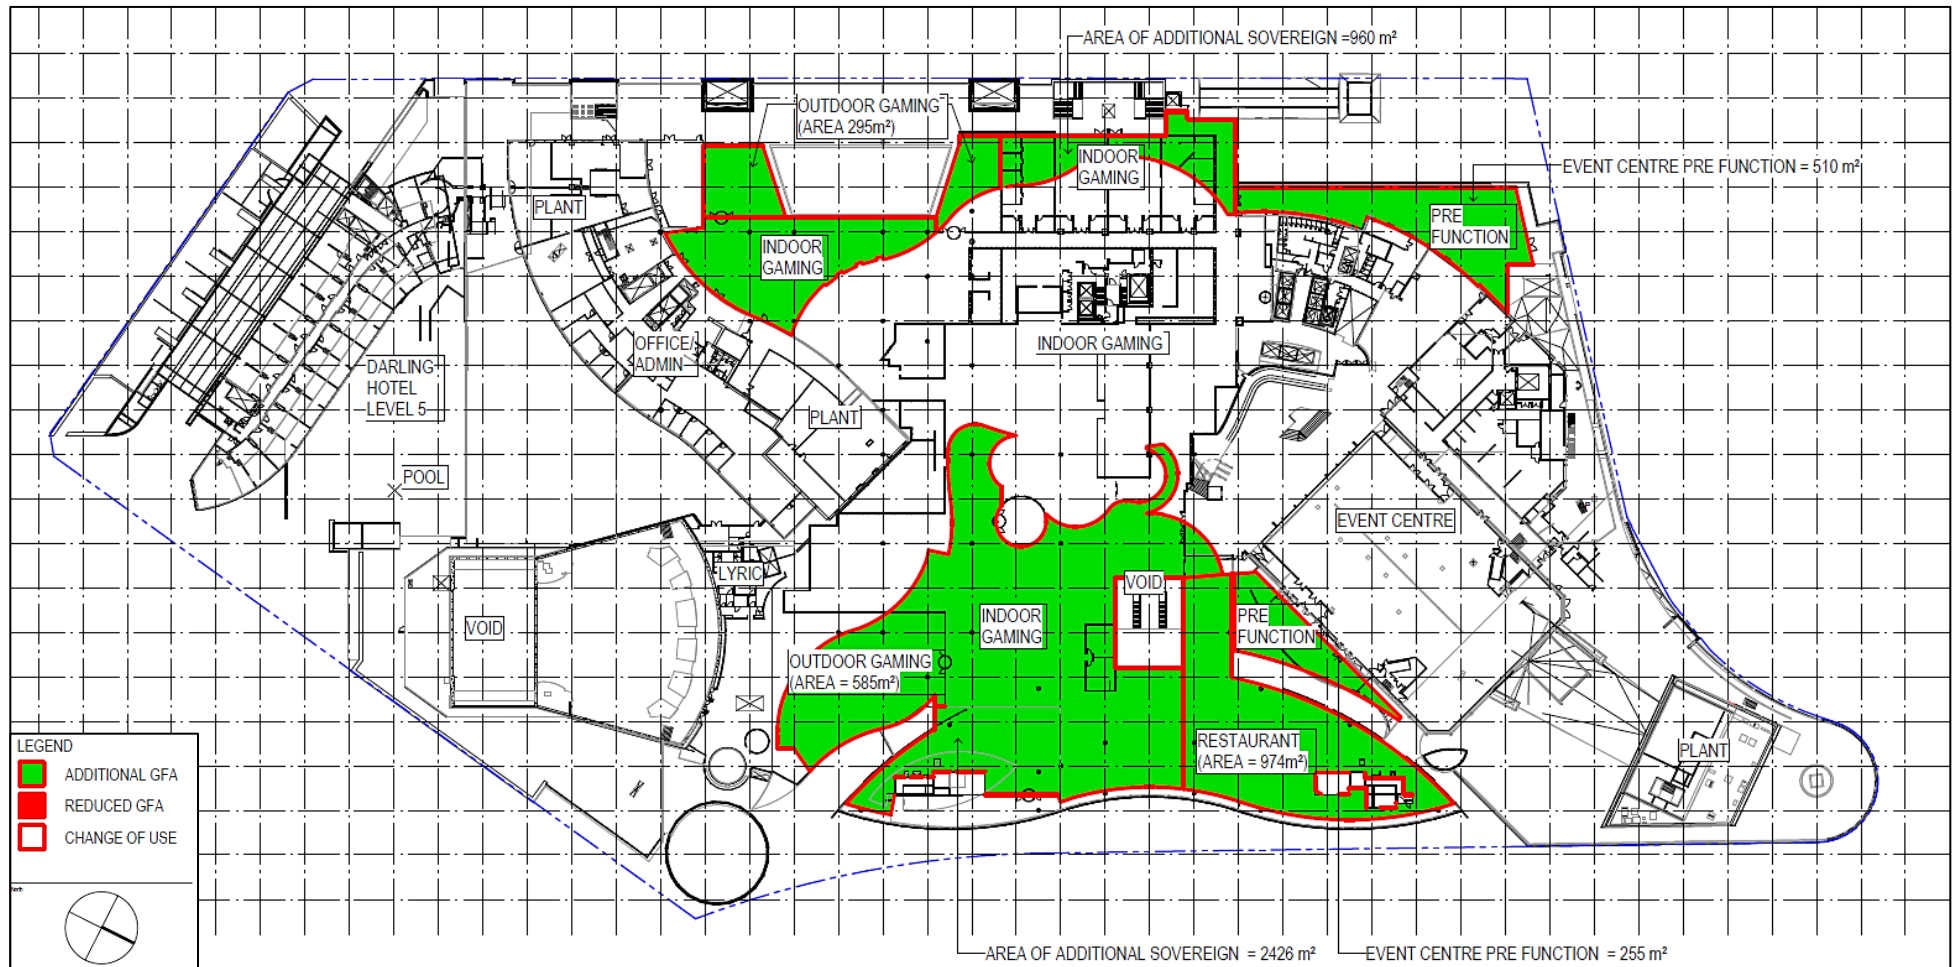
Proposed extended gross floor area (in green) on Level 03 providing additional gaming floor area and food and beverage offerings (Source: Proponent's EA)
